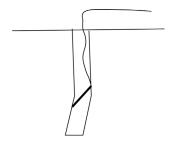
In a bent pile, rebar gets stuck in the bent.
